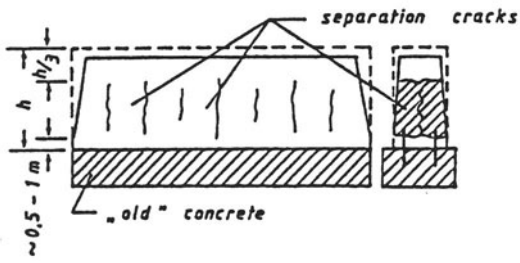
Cracking due to coupling of different age concrete in a wall.
